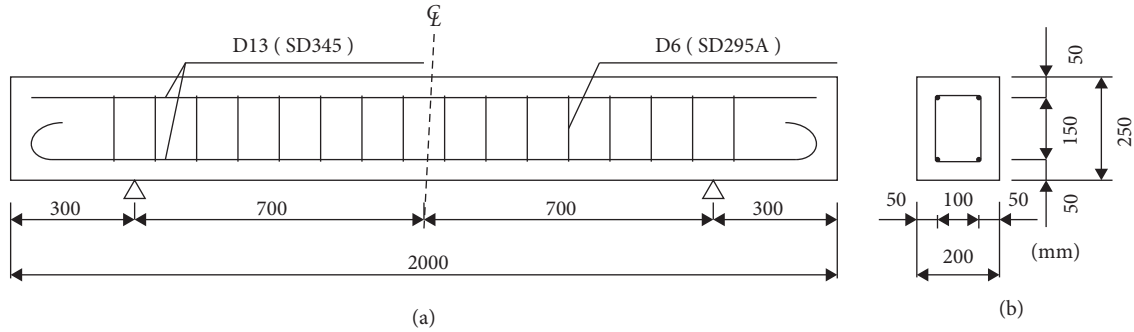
Outline of the test specimen. (a) Side view. (b) Sectional view.
